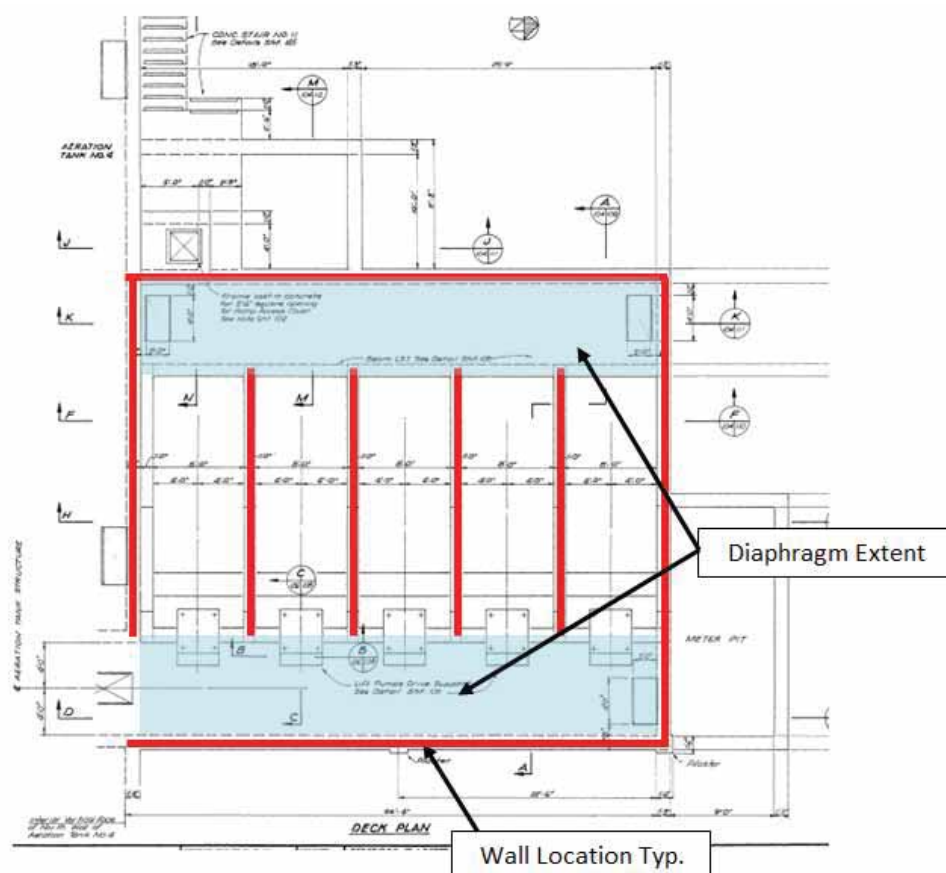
Lift Station #1 Concrete Wall and Concrete Diaphragm Locations
